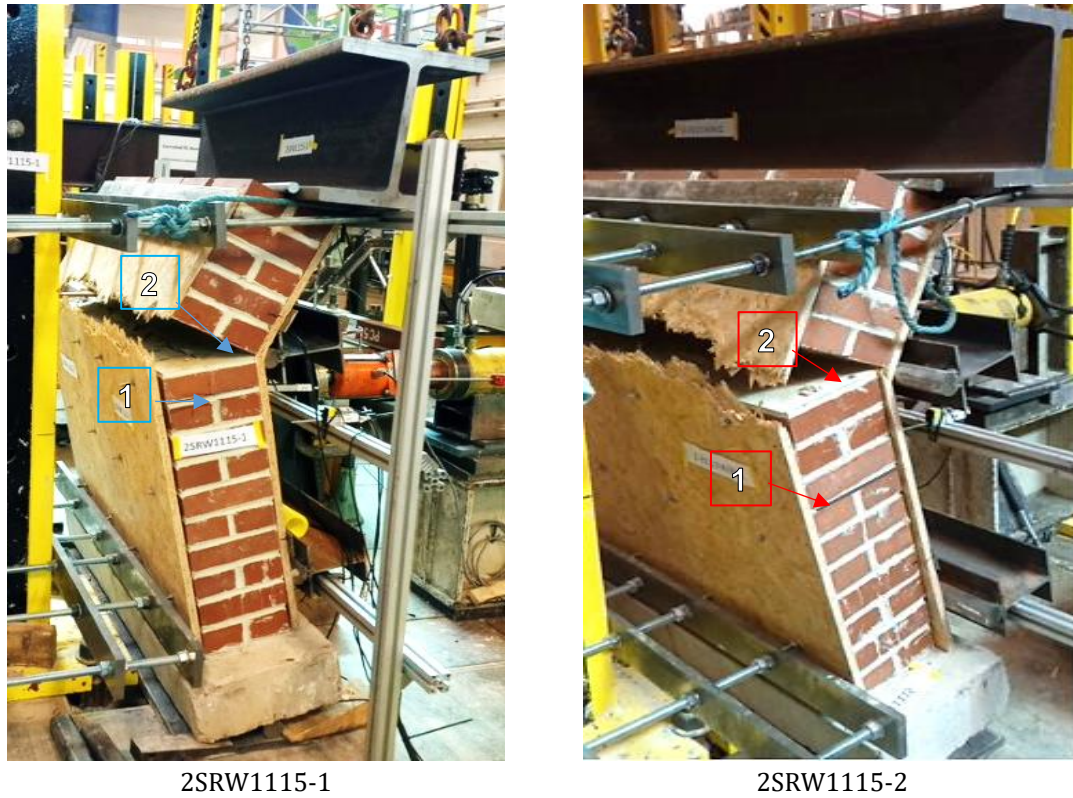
Failure pattern of retrofitted masonry wall
